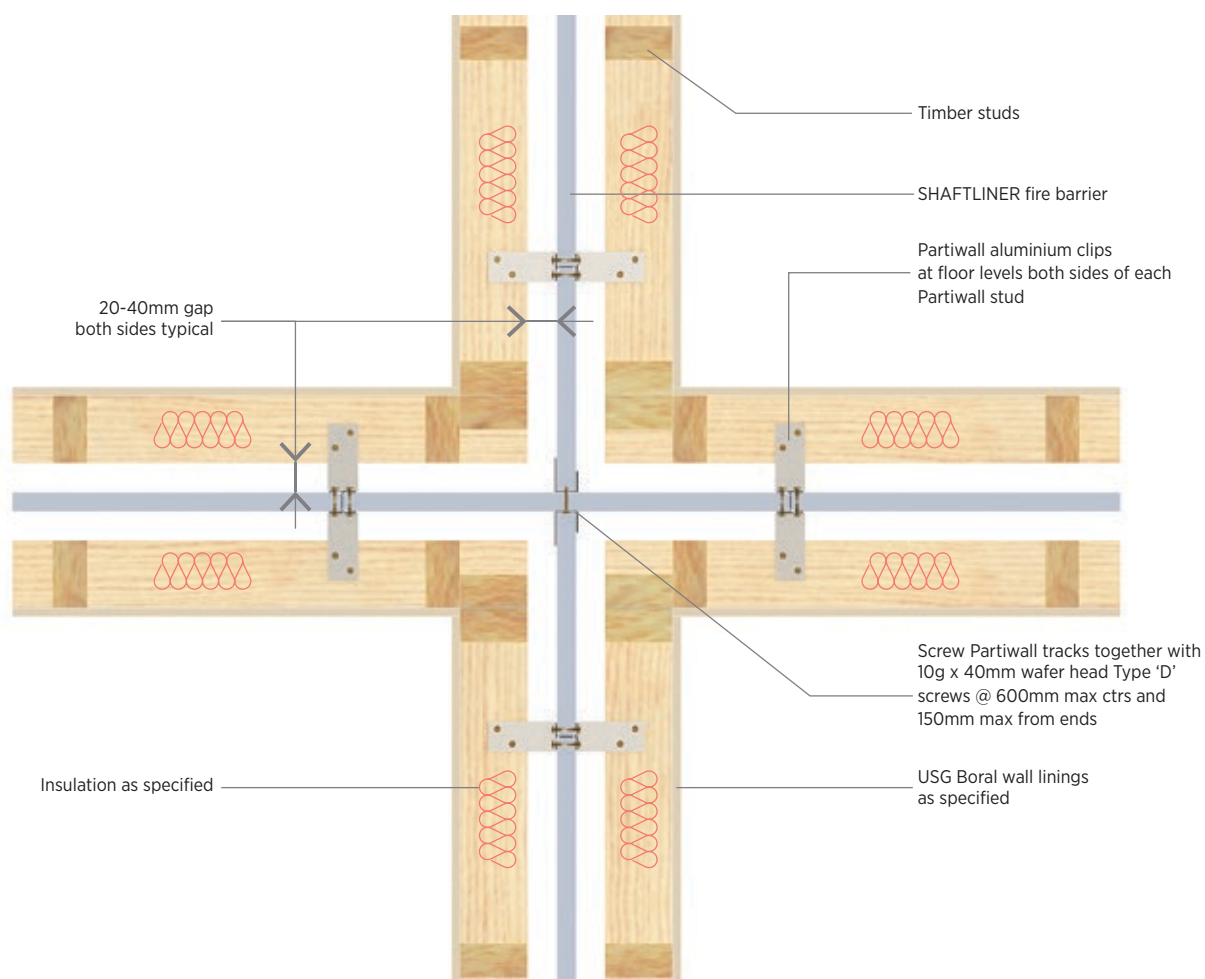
4-Way Intersecting Wall - Plan Detail - FRL 60/60/60
